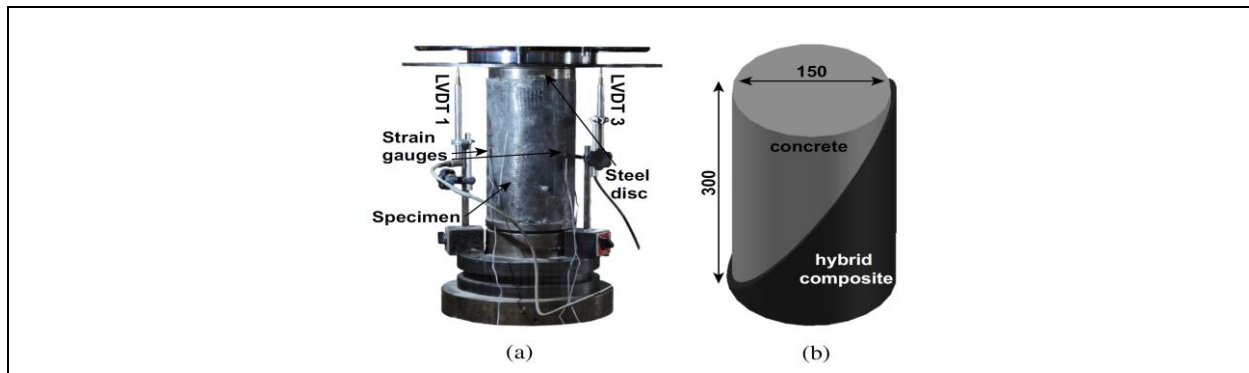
Axial compressive test: (a) illustration of the test and (b) geometry of specimen (dimensions in mm).
